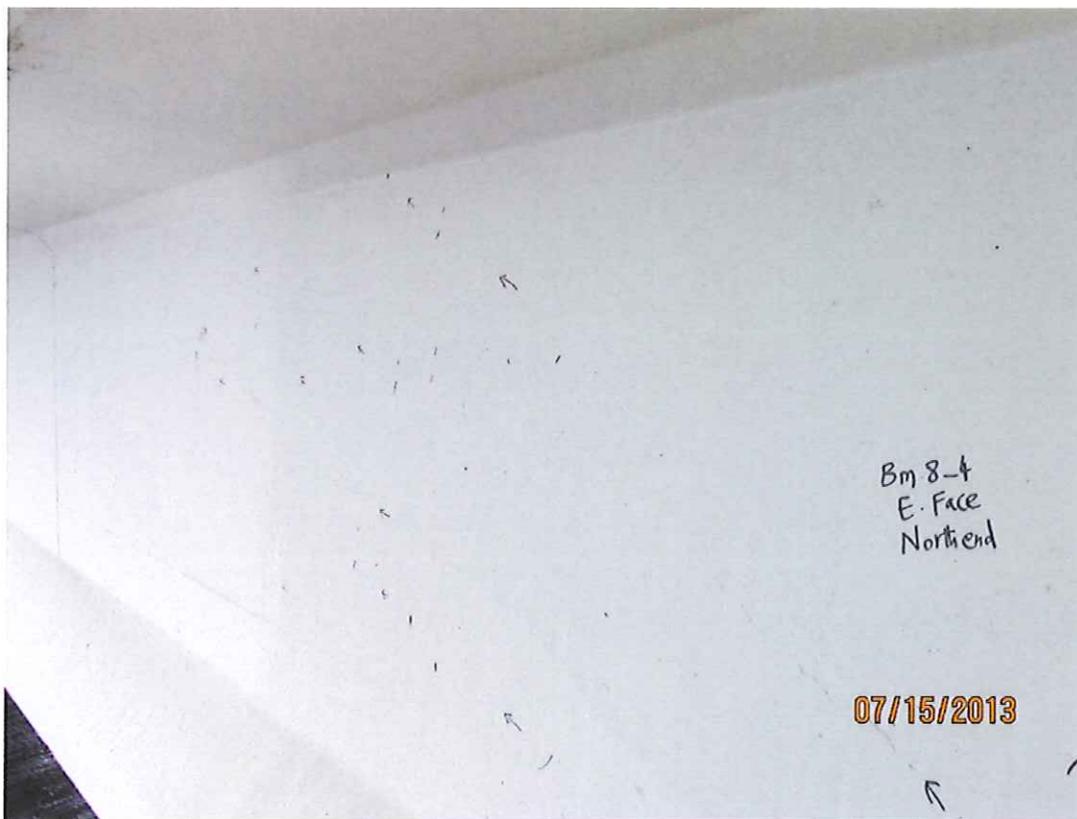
Typical diagonal/shear cracks in beam webs near the beam ends
